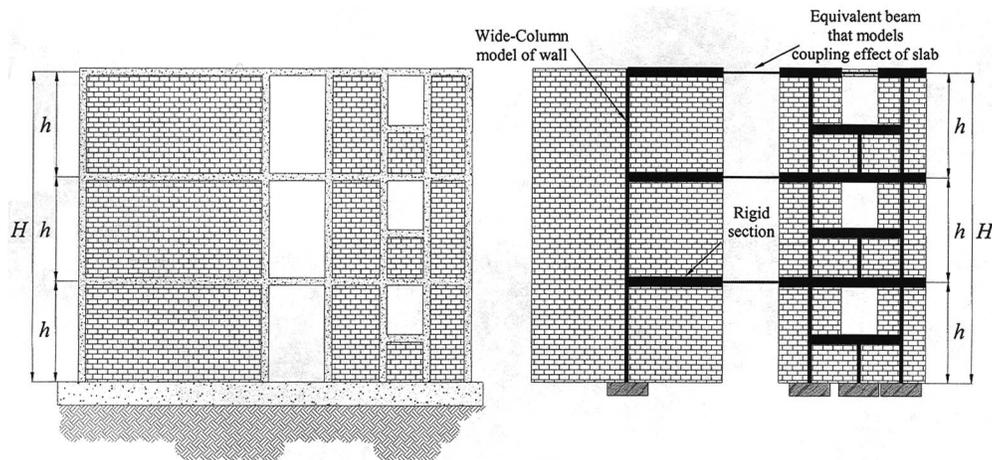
Elastic analysis technique for confined masonry buildings: a) confined masonry building, b) wide-column model of building.
